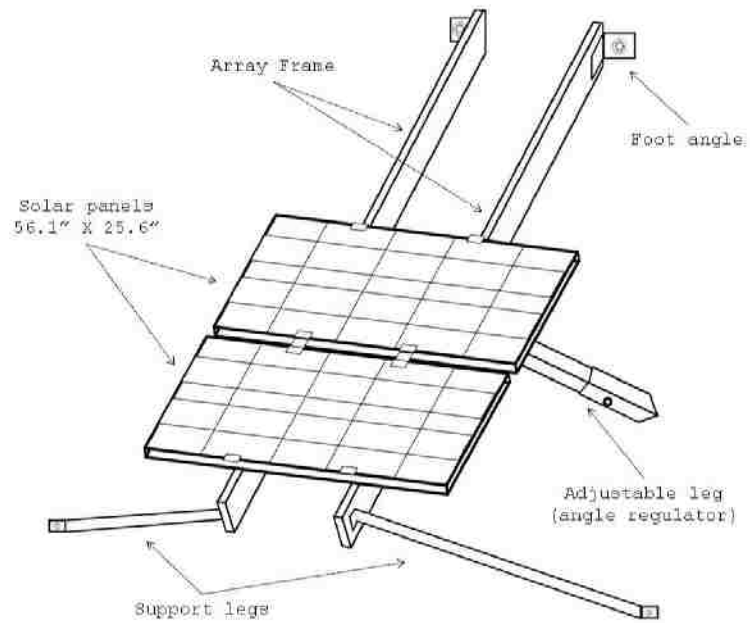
Structural systems to support solar panels and attach them to the bridge.
